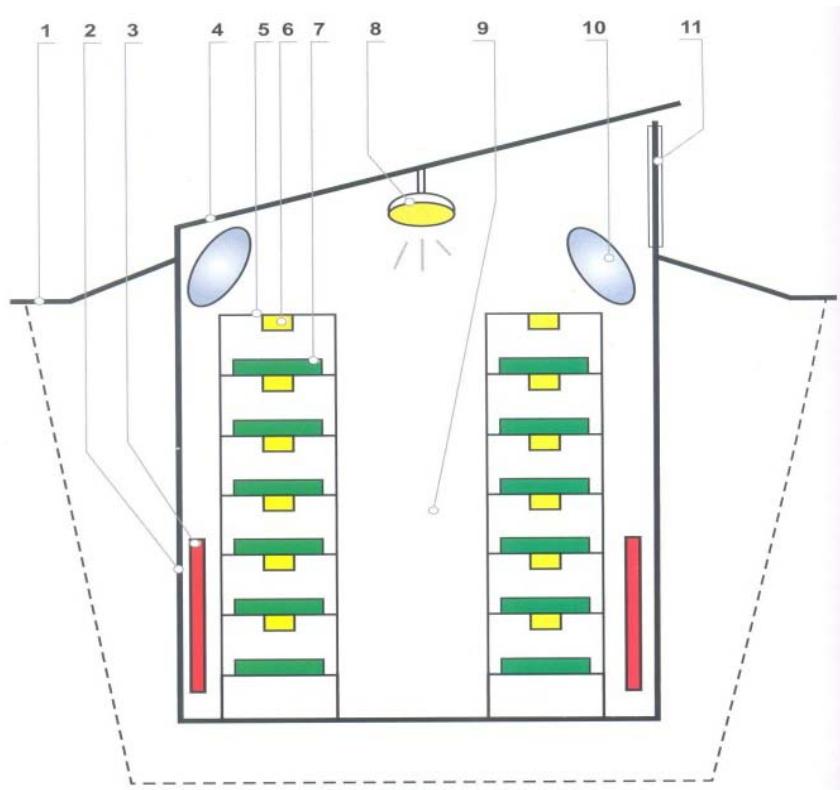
Scheme of arrangement of trench greenhouses (right): 1-soil level; 2-wall; 3-heating system radiators; 4-roof; 5-multi-layered hothouse rack; 6-sources of artificial lighting; 7-trays for cultivation; 8-security lighting lamp; 9-process passage; 10-fans; 11-double-glazed light aperture
